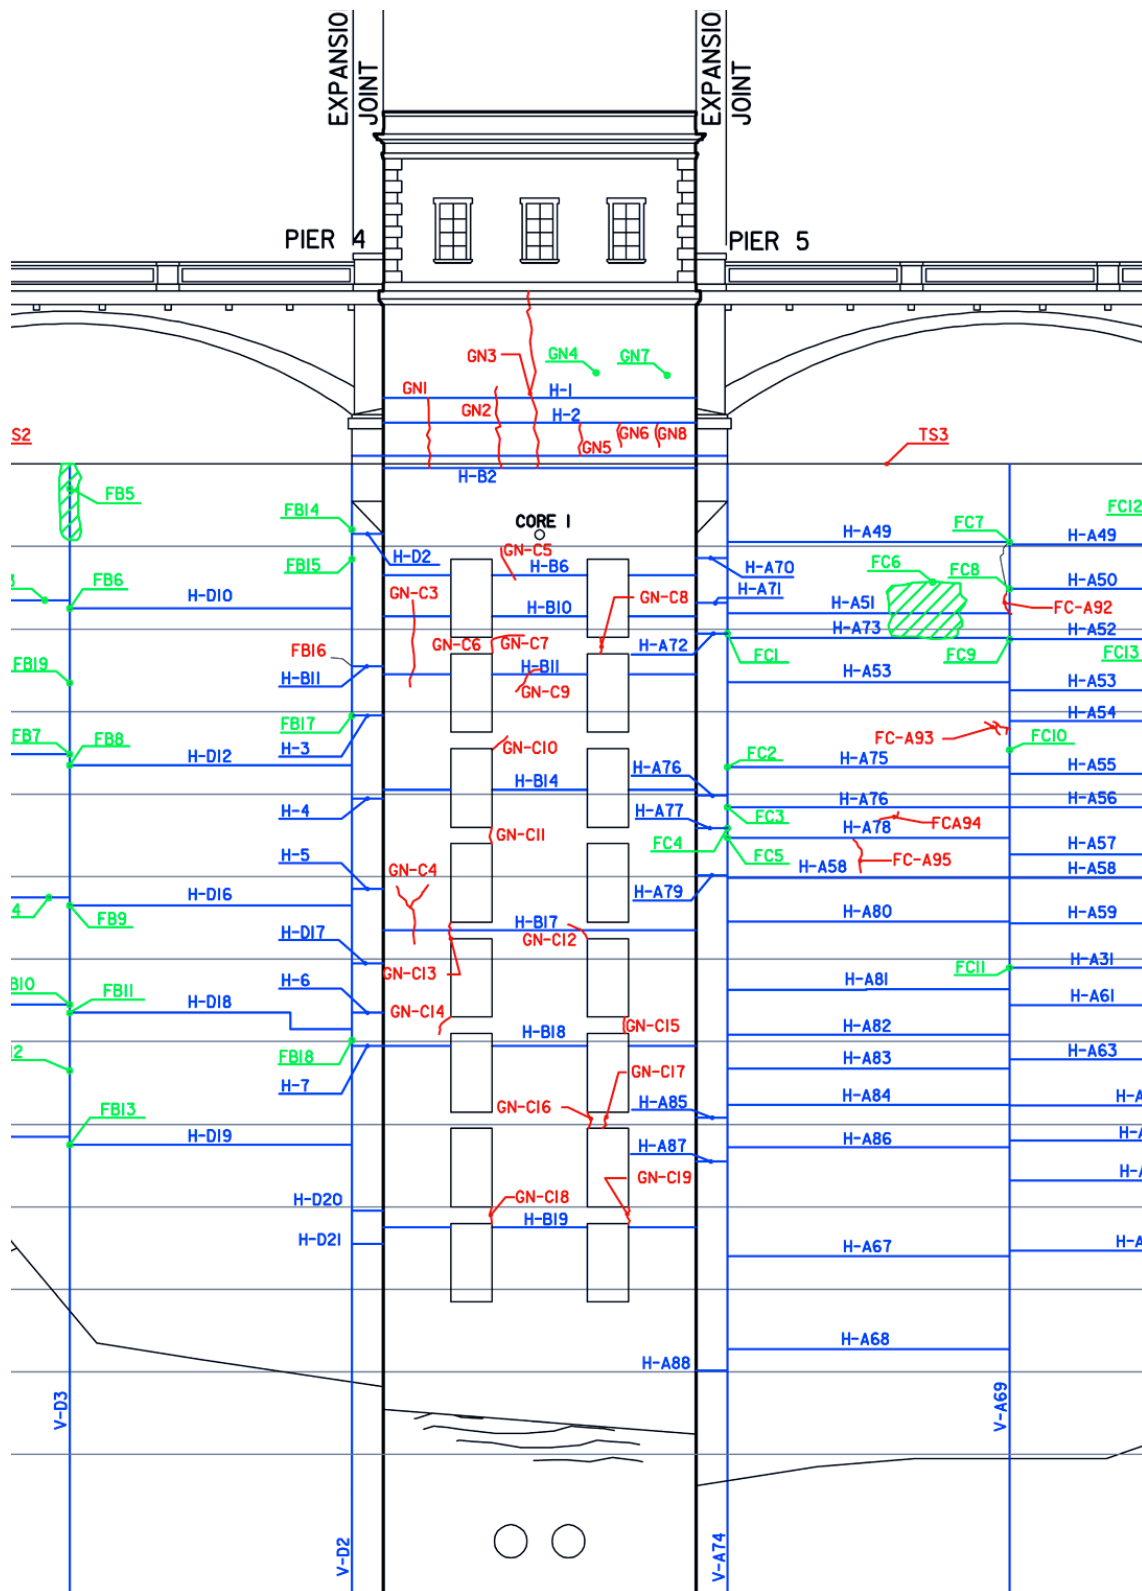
Cracking in Upstream (North) Face of Gatehouse
